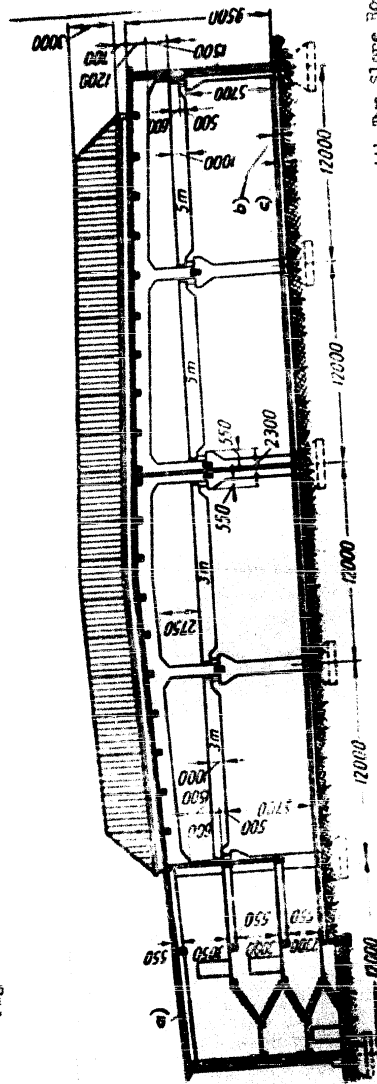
Cross Section of Four-Story Building of Reinforced-Concrete Construction with Two-Slope Roof
